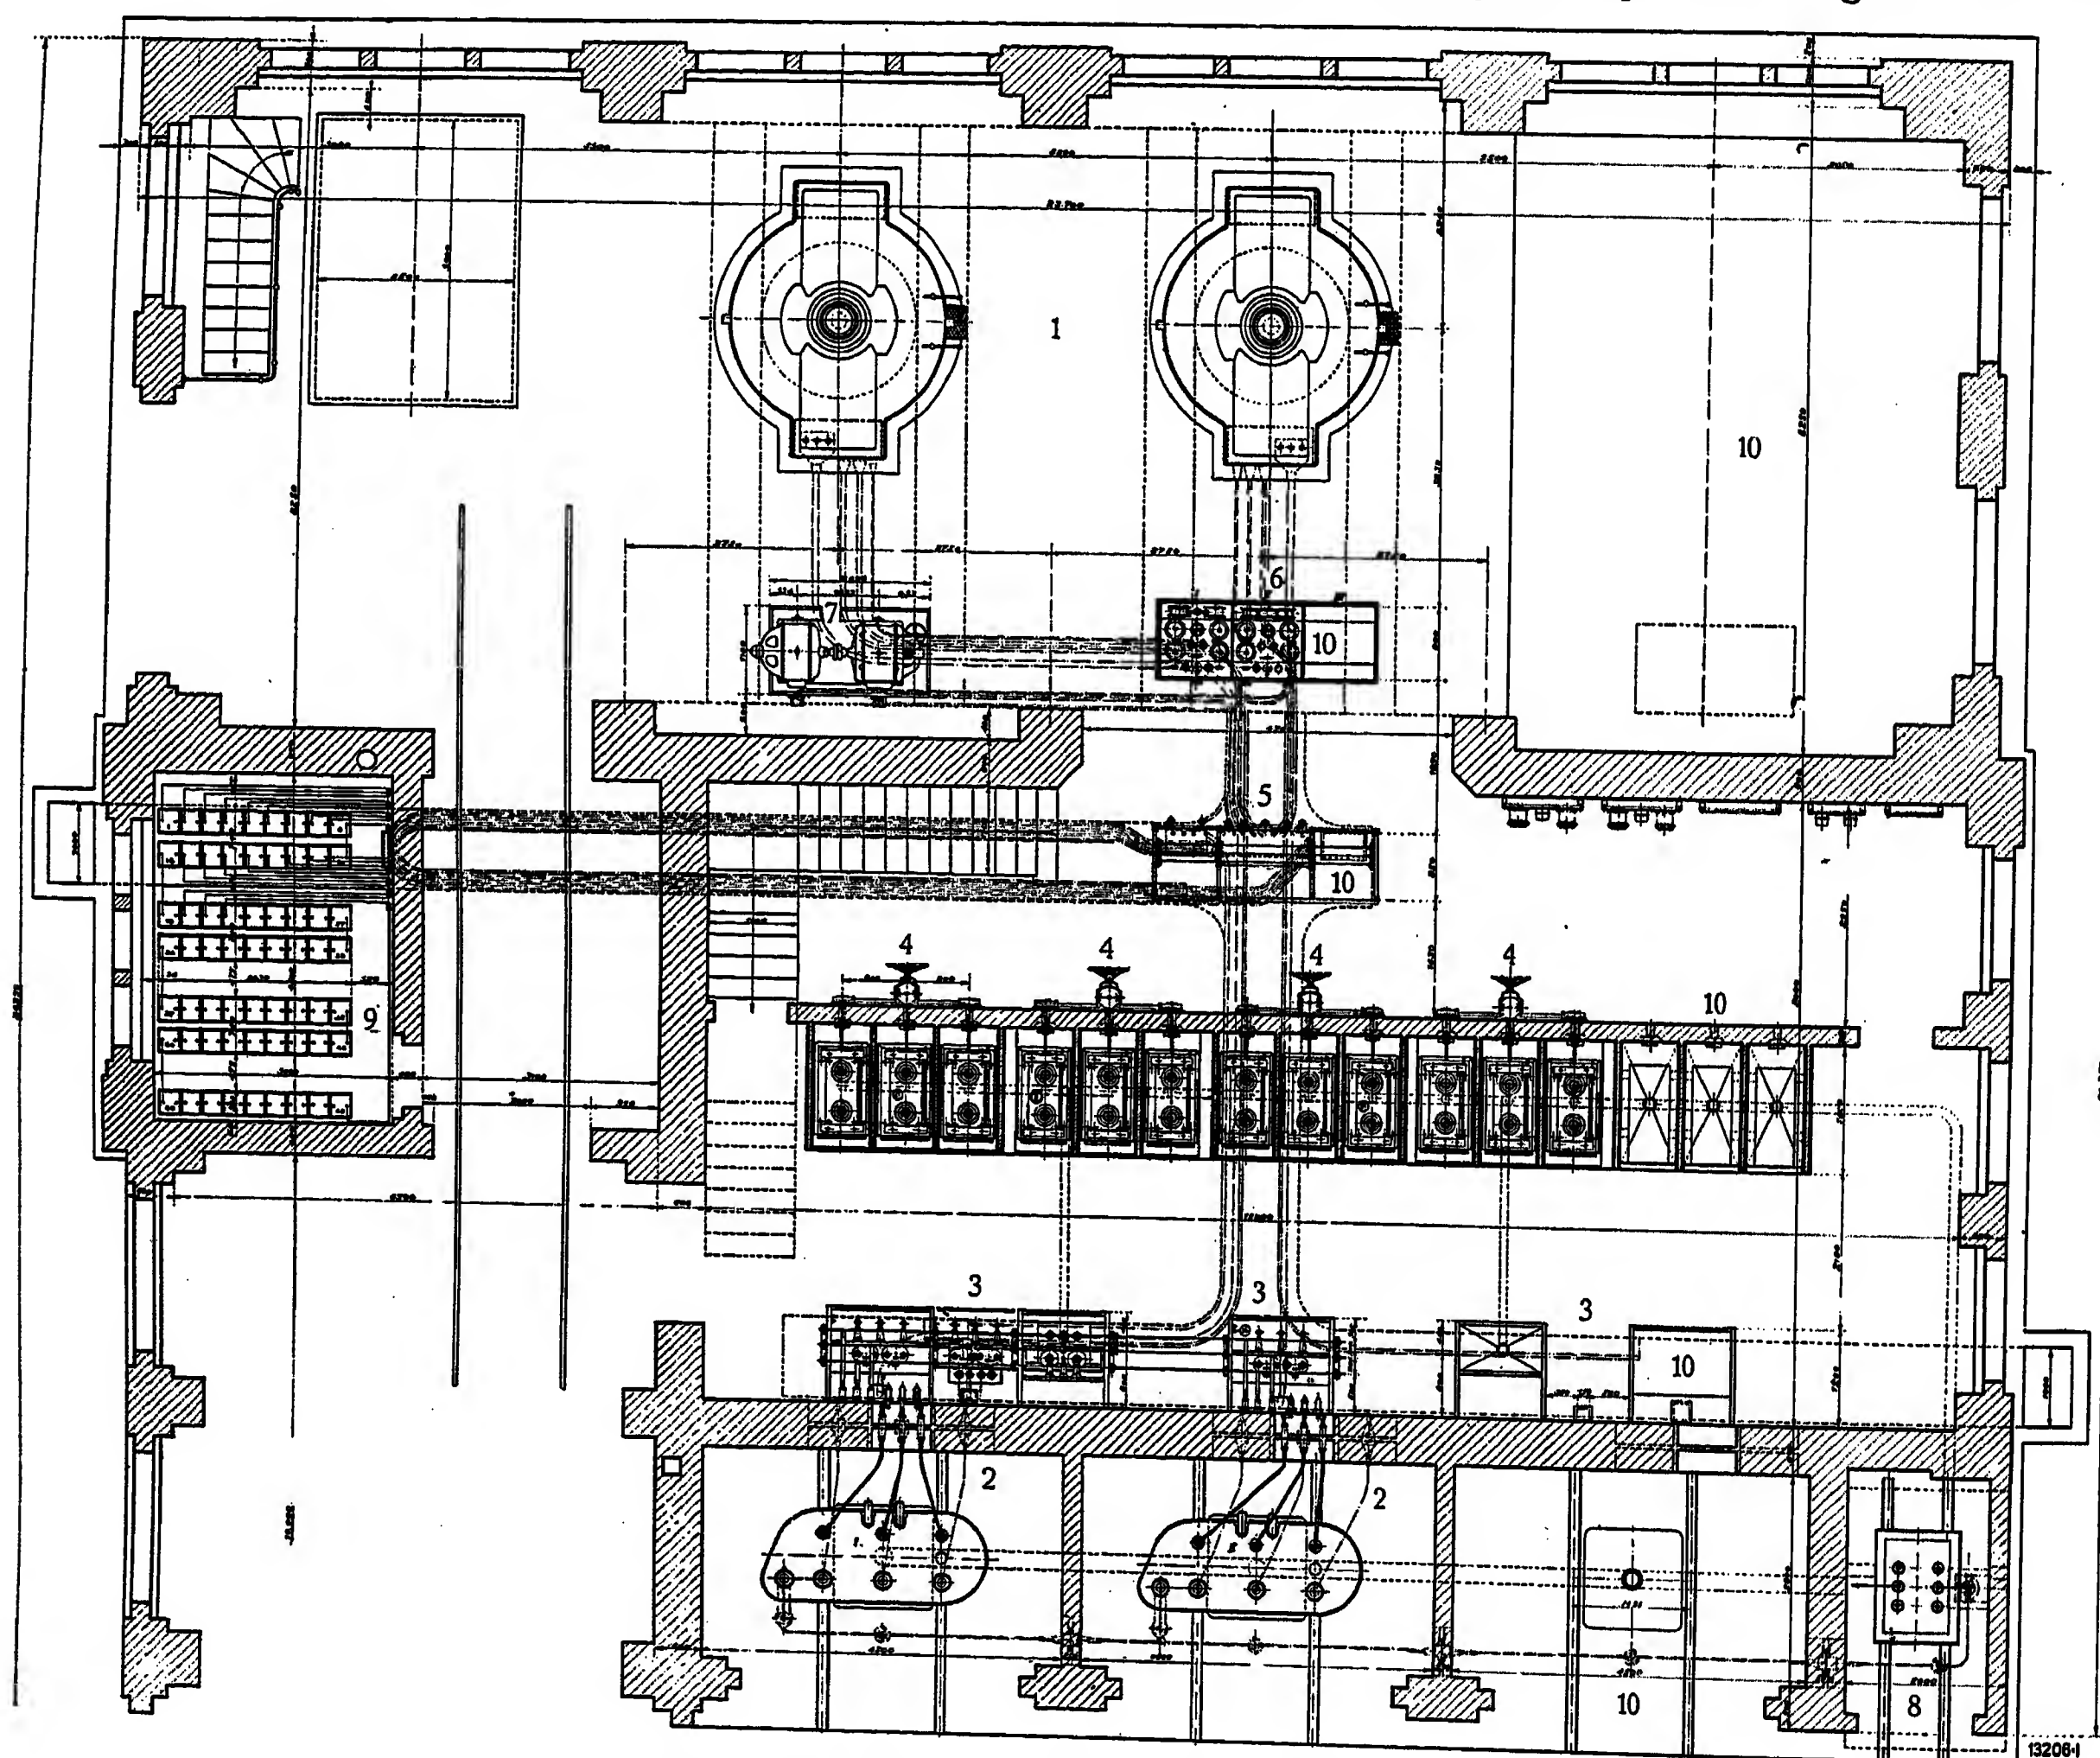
Plan of the switch house (ground floor), section E F, Fig. 7.
